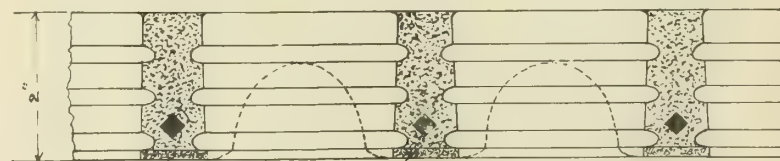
SIDEWALK VAULT LIGHTS, SECTIONAL VIEW
